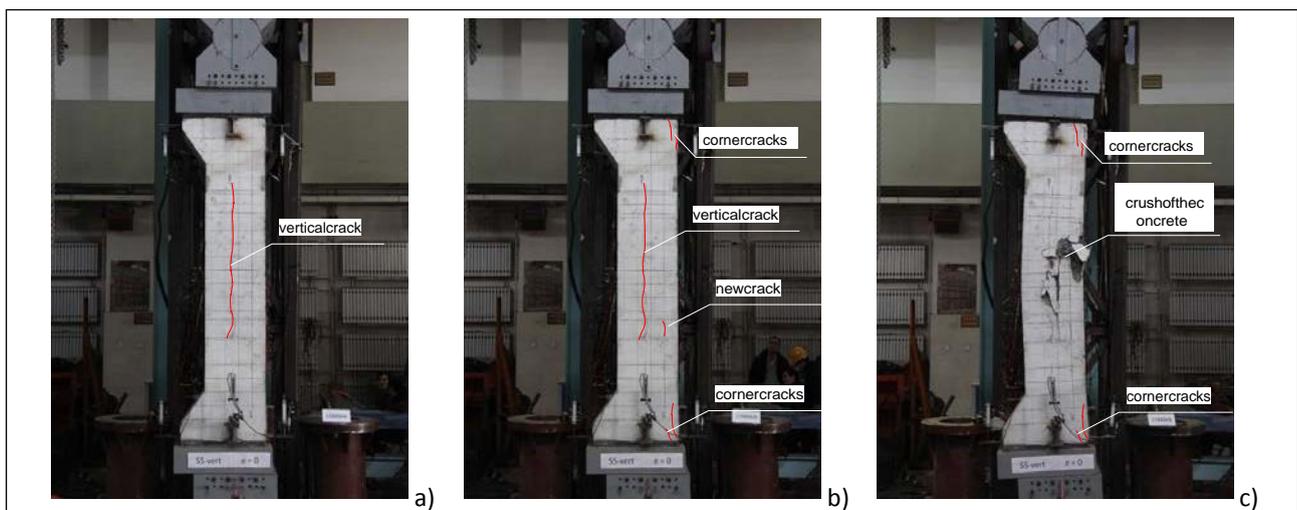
Crack development of specimens subjected to axial load:a)70% of the maximum load;b)after the maximum load;c)failure load.
